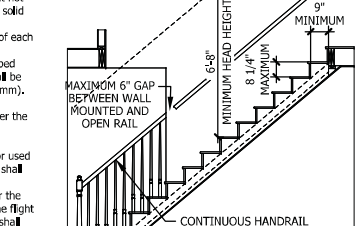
TYPICAL DECK STAIR DETAIL
